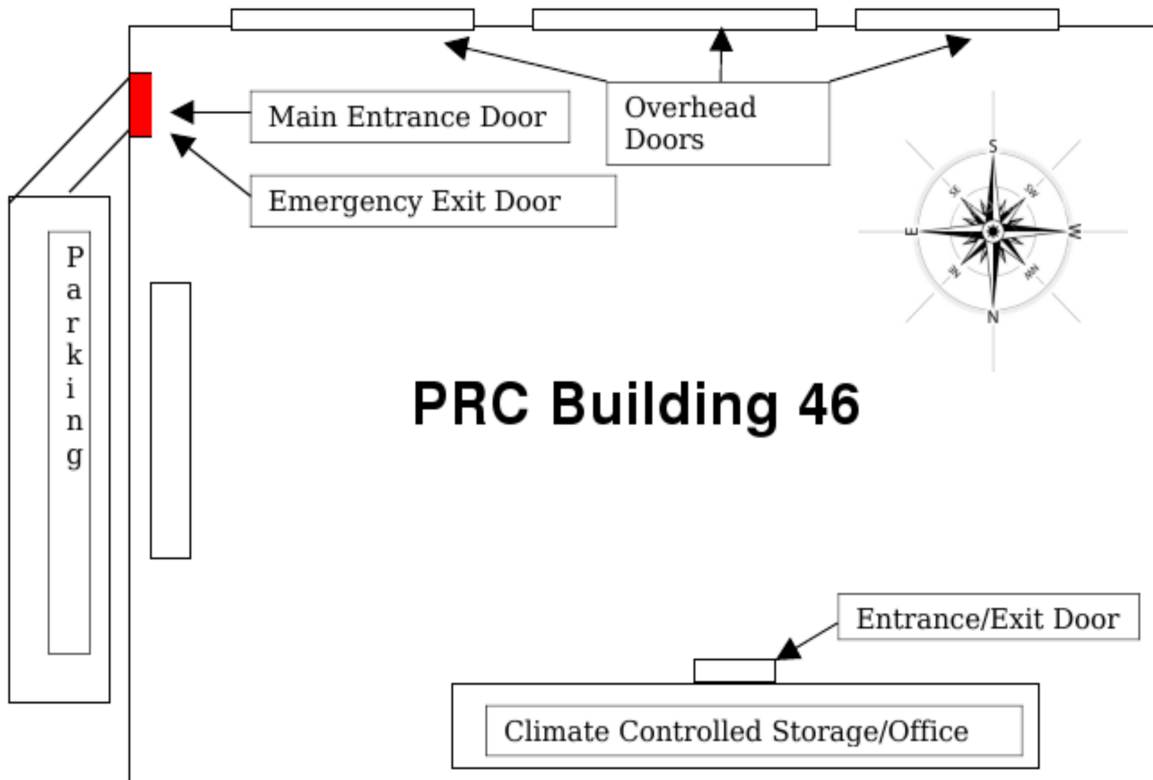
BUILDING 46 EMERGENCY EXIT FLOORPLAN
